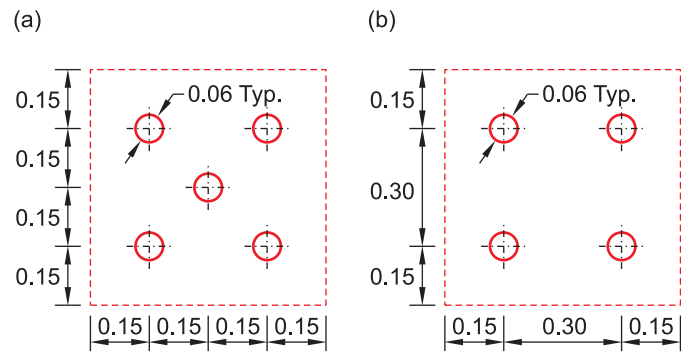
Patterns of the piles of the two other tested specimens: (a) 5-pile foundation specimen, and (b) 4-pile foundation specimen (All dimensions are in meters).
